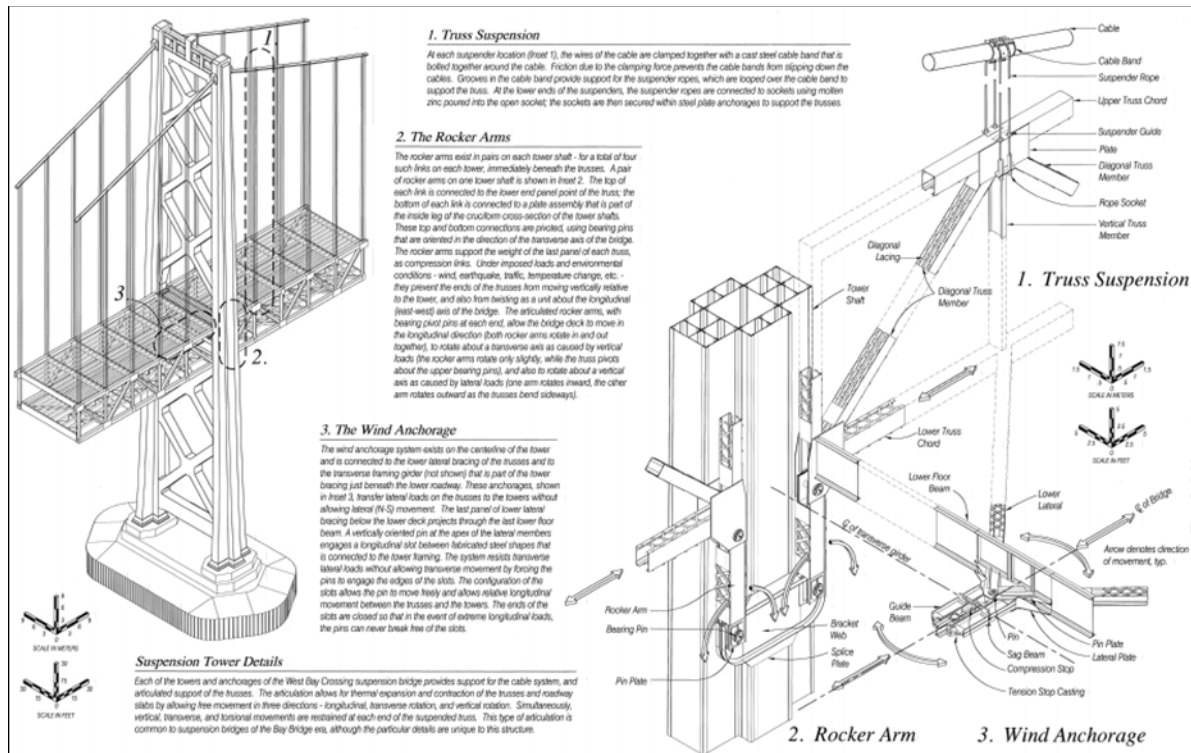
Illustrative Details of Example Steel Cellular Bridge Tower
